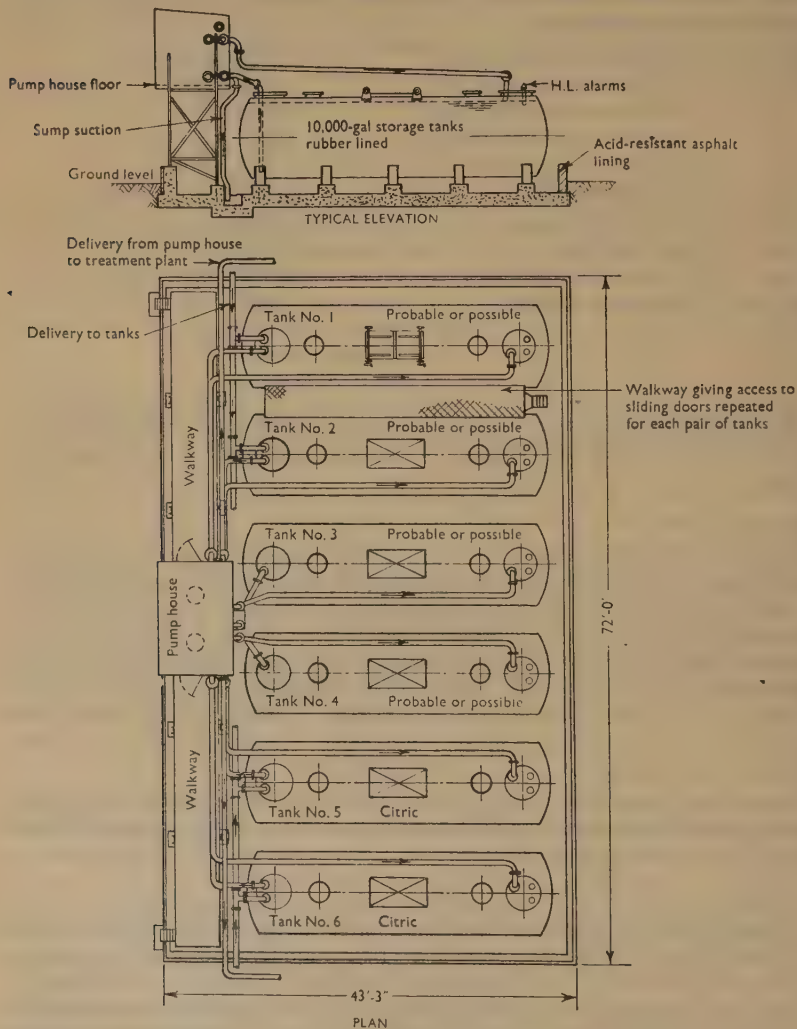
TYPICAL BULK-STORAGE AND PUMP-HOUSE INSTALLATION
